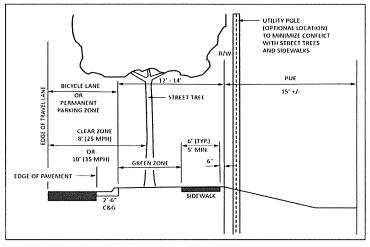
Recommended Green Zone and Sidewalk Zone (Complete Streets Planning and Design Guide)
